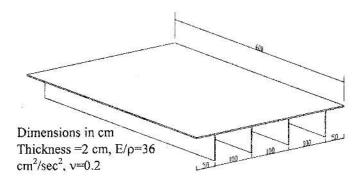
Straight Slab/Beam Bridge (Example 1)
